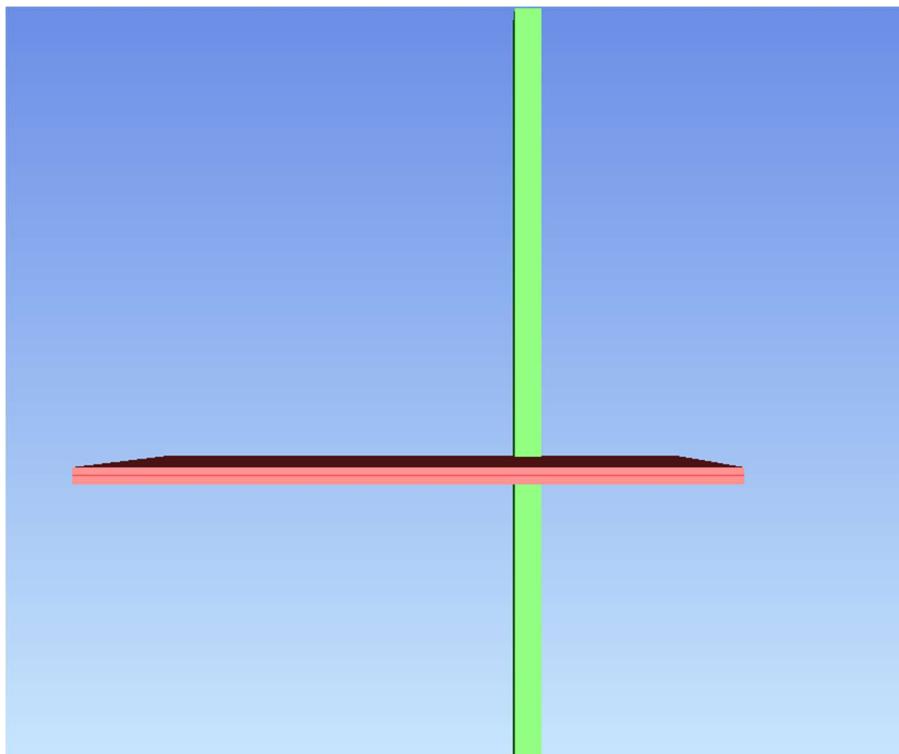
Medium Clash of Architectural wall (Element ID 1316) vs Structural secondary beam (Element ID 181270) – Bottom Side View
